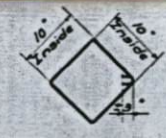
DETAIL OF METAL SHELLS FOR CAST IN PLACE CONCRETE PILES
